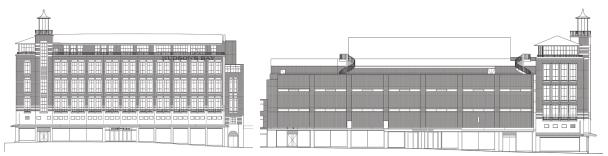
Two facades of Leiden (made by façade&roof scale group).
